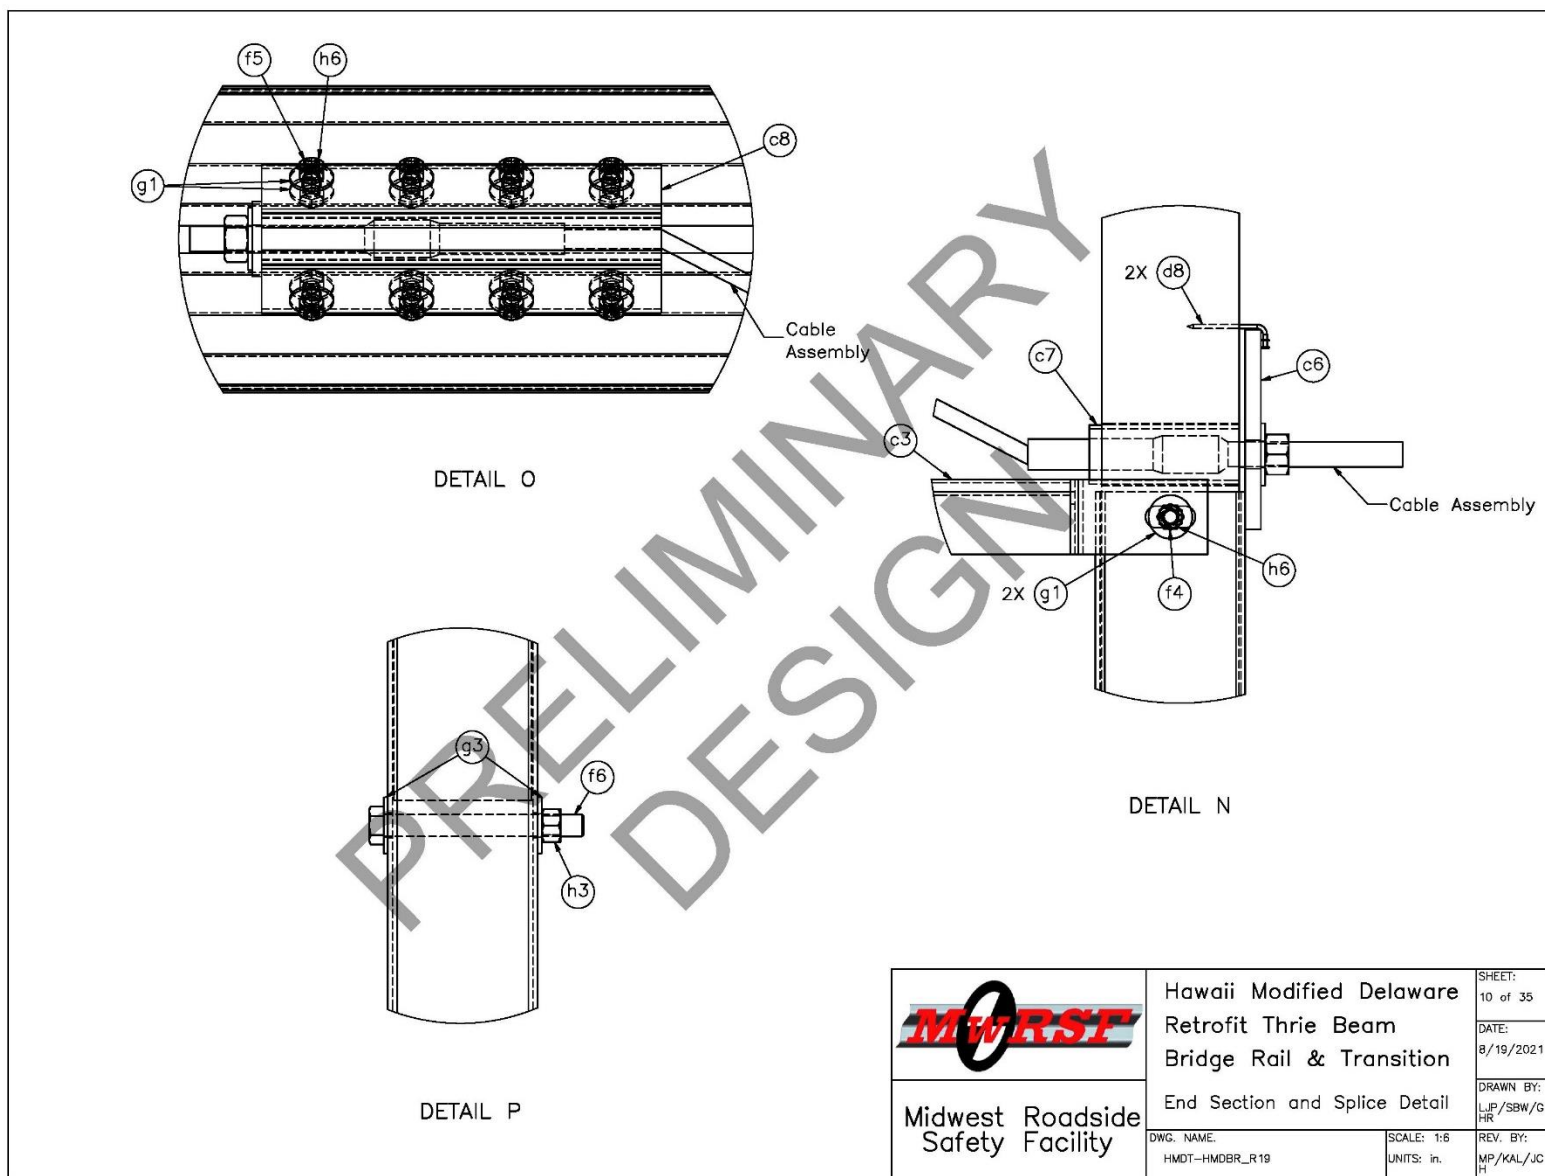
End Section and Splice Detail, Test No. HMDT-1
